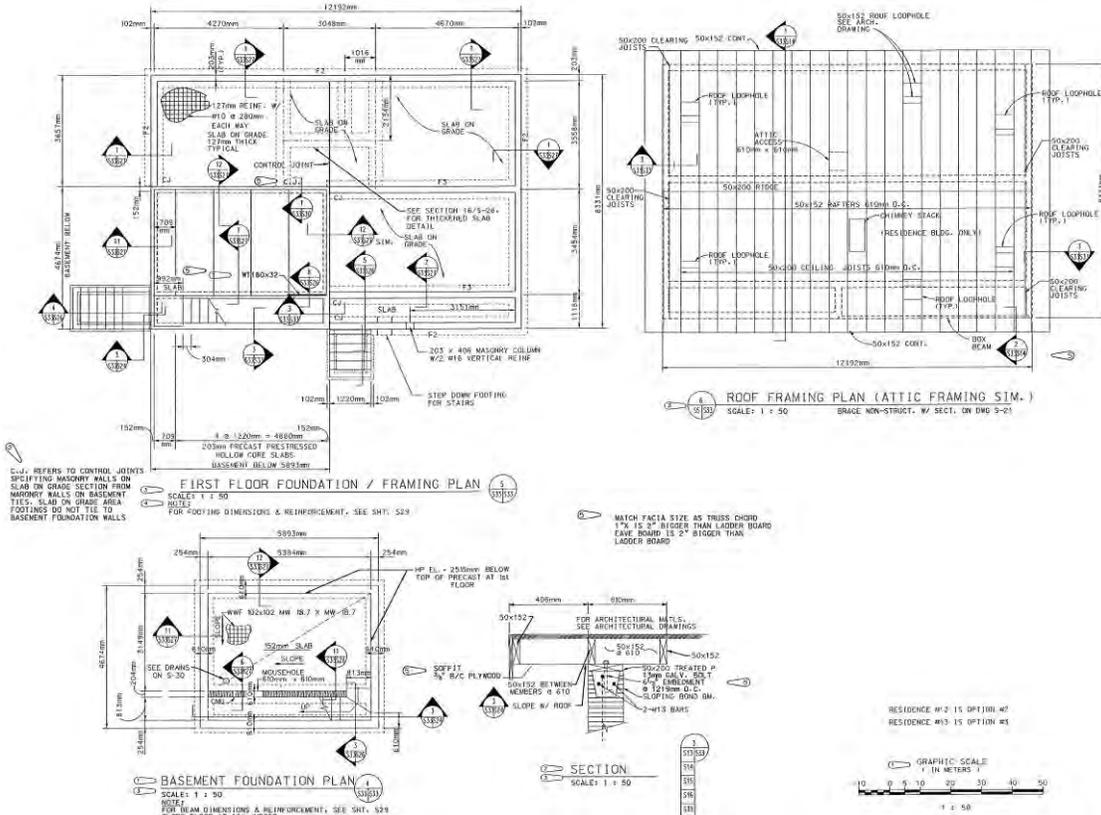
MOUT training complex radio station foundation and framing plan, Fort Bragg, NC, 2002 (standard drawing 179-97-01 S-33 sheet 123; military operations in urban terrain, MOUT training complex, radio station foundation and framing plan; 29 January 2002).
